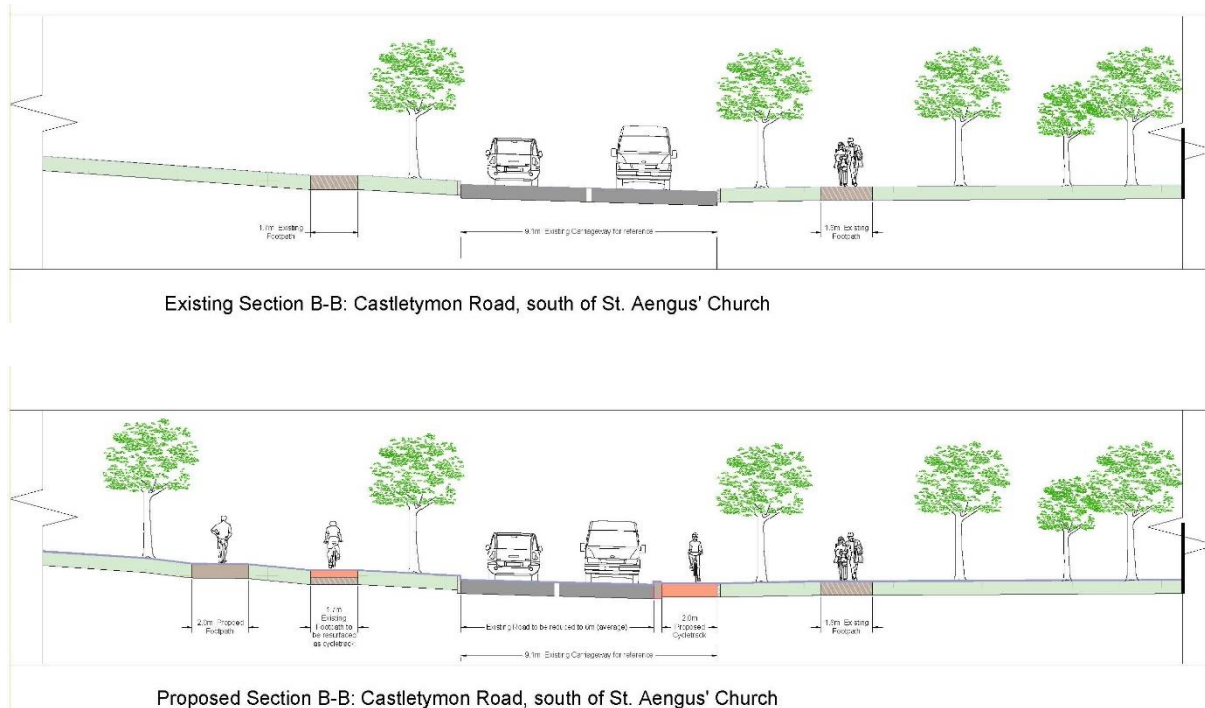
Existing and Proposed Sections of Castletymon Road South
